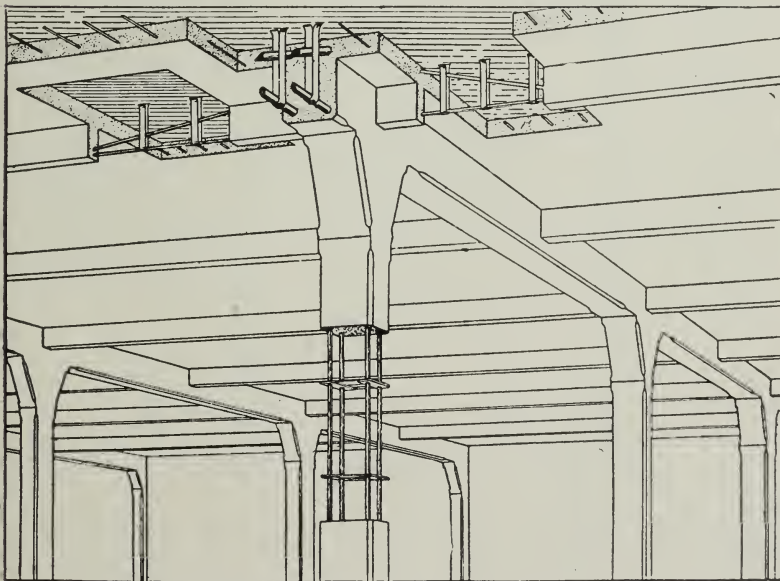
Hennebique System of Reinforced Concrete Construction.
